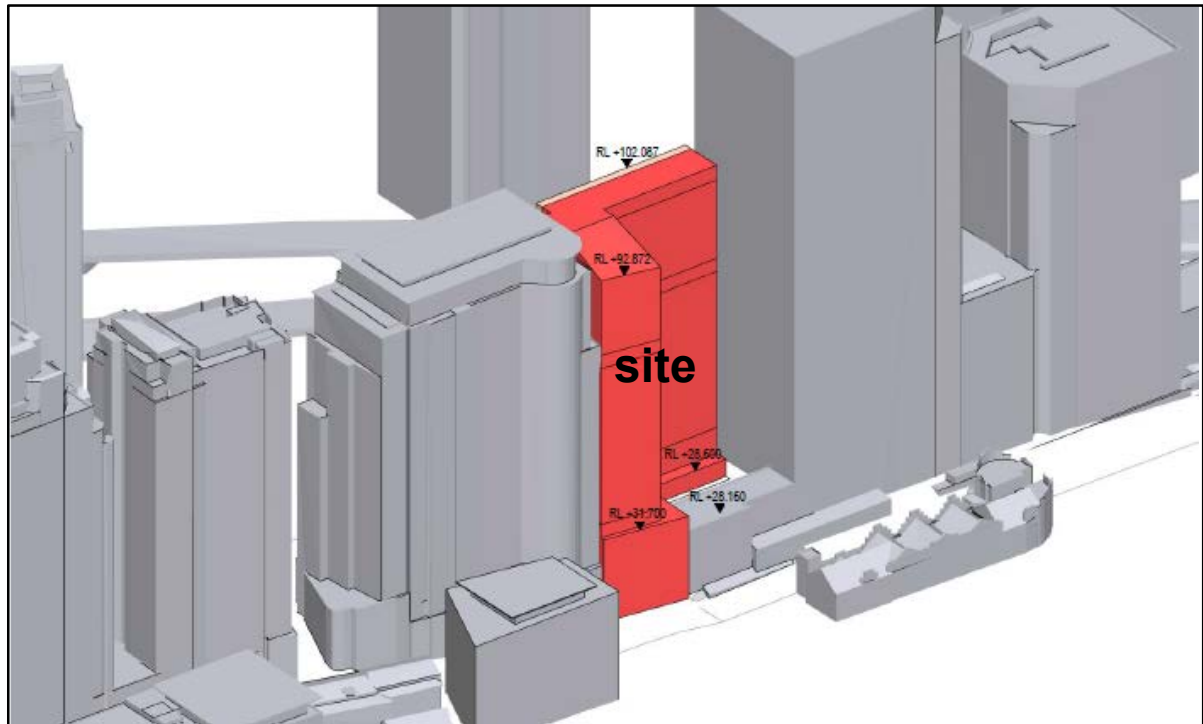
Proposed building envelope as viewed northeast from Jenkins Street
